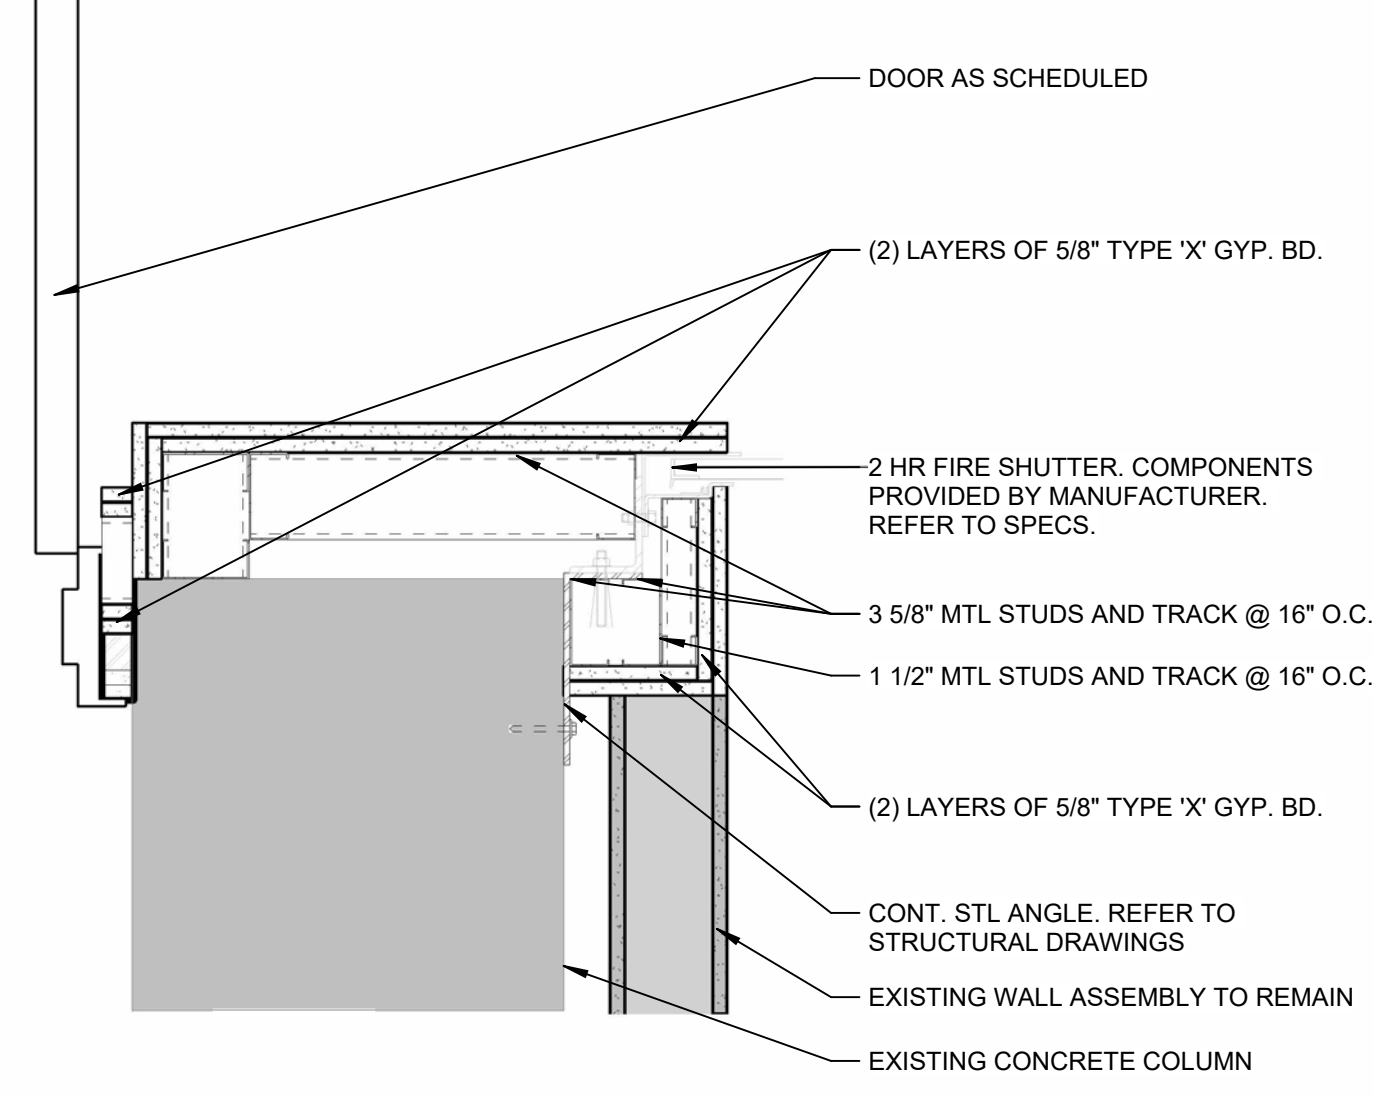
DETAIL AT FIRE SHUTTER - EGRESS DOOR A5
